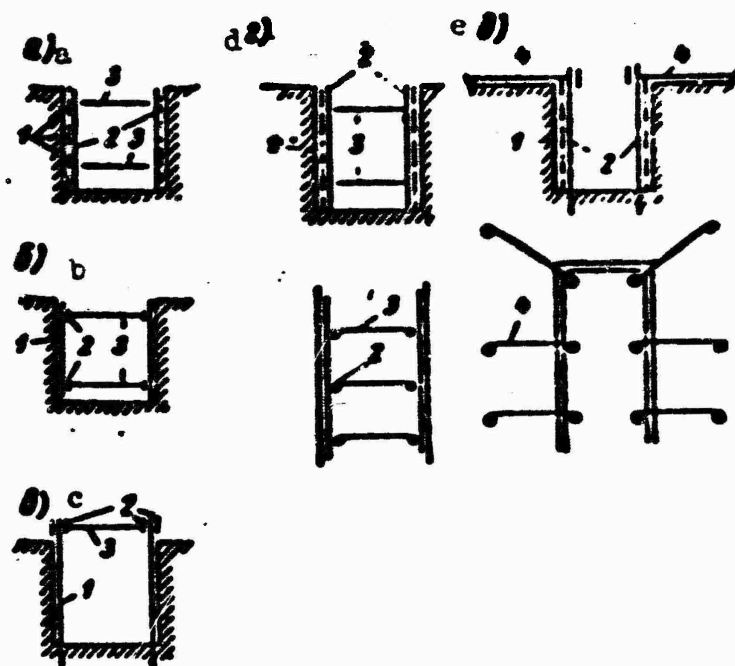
Types of trench bracings by the character of board placement in the vertical wall (a, b, and c) and by the character of elements supporting the supports and girders (d and e). a) Horizontal; b) vertical; c) sheet pile; d) thrust; e) anchor. 1) Boards; 2) supports; 3) thrust beams; 4) stays (anchors).
